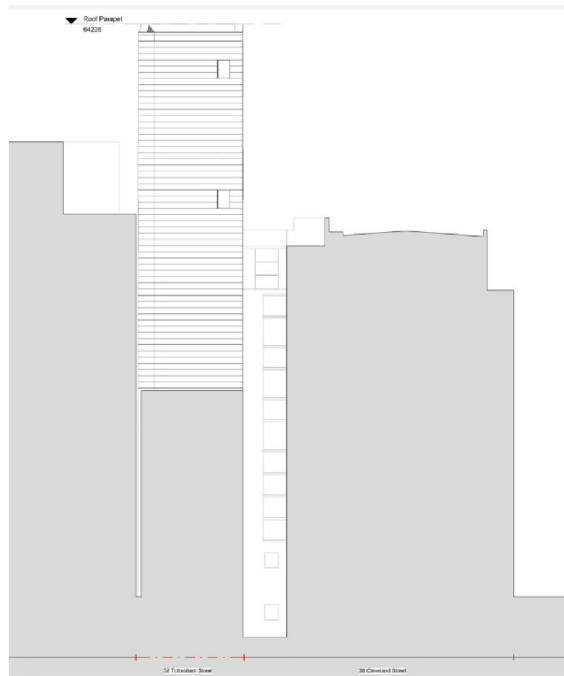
Blank Proposed Elevation Facing Roof Terraces at 30 Cleveland Street
